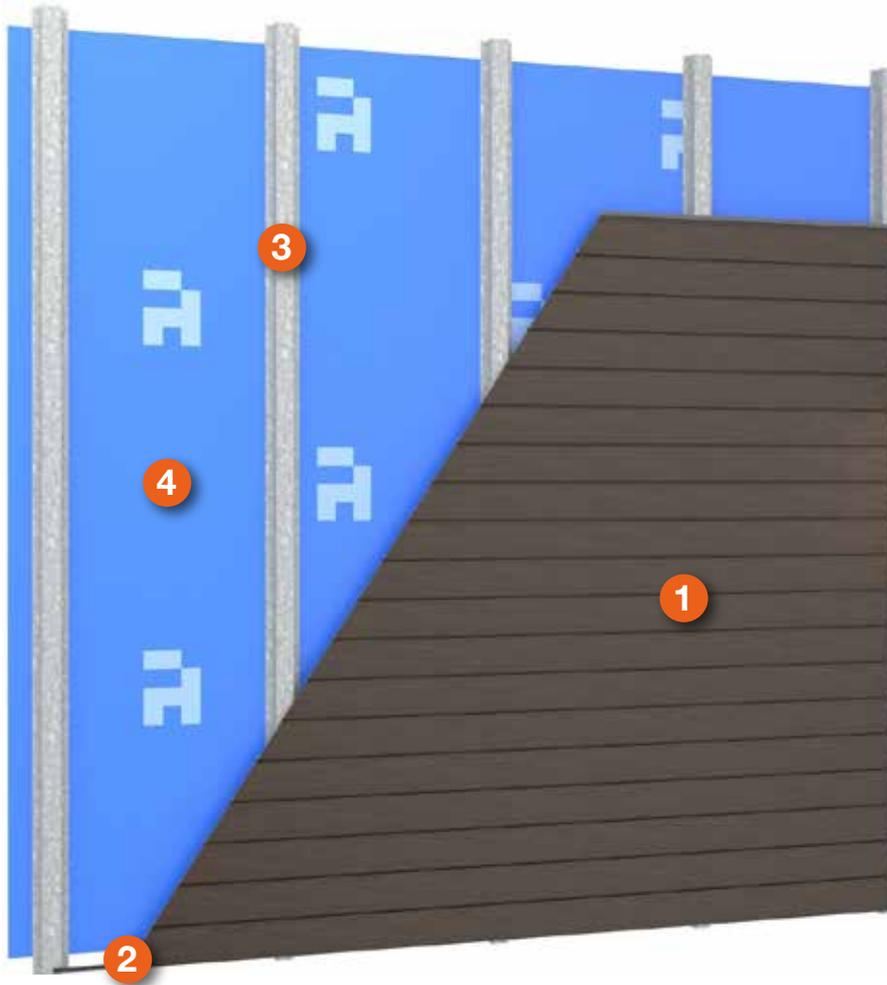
Typical vertical exterior direct fix cladding installation – fixing distances
